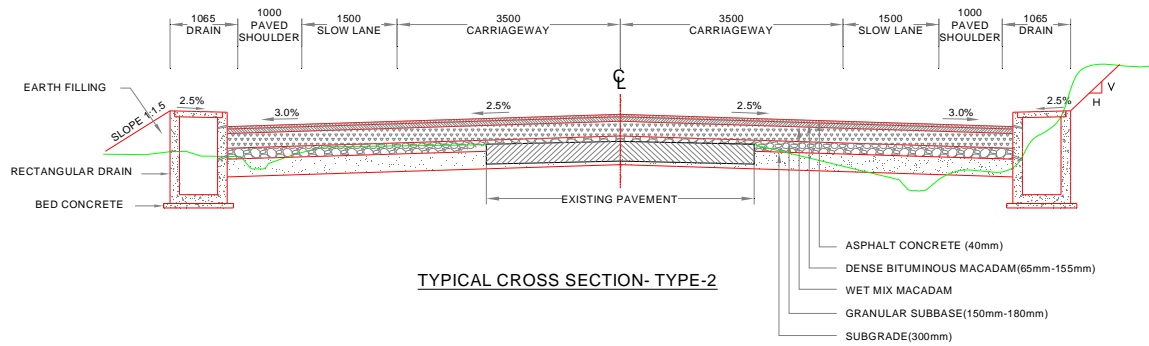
TYPICAL CROSS SECTION- TYPE-2
